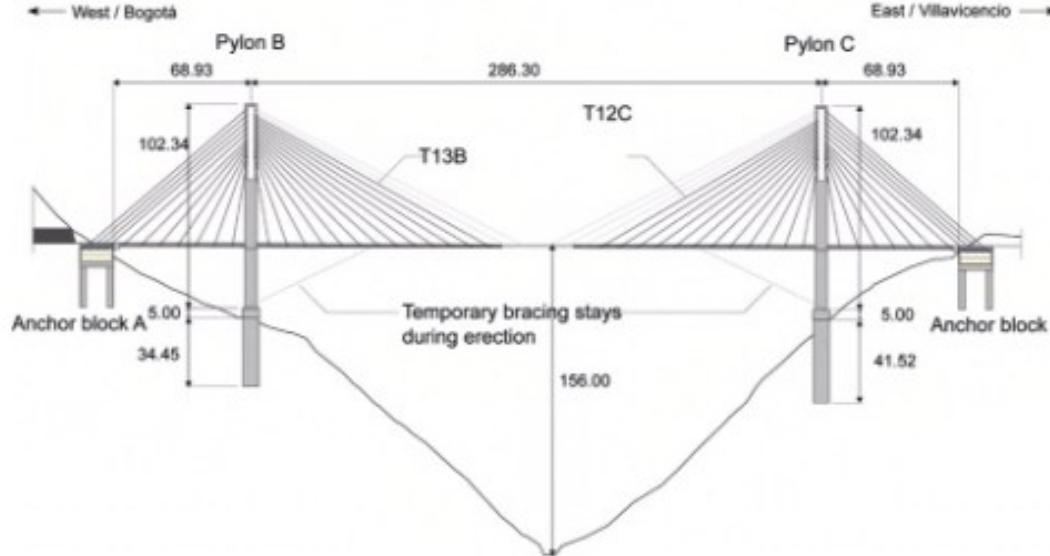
General dimensions of the Chirajara Bridge. Members of the main span (cable + girder) shown in light grey shading had not yet been erected at the time of the collapse of Pylon B
